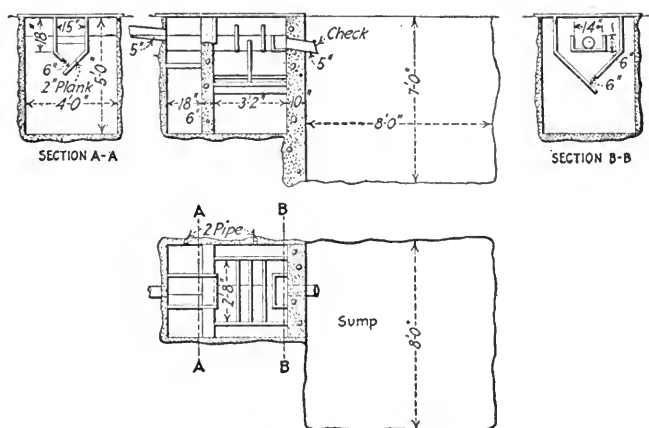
ARRANGEMENT OF UNDERGROUND SEPTIC TANK.
